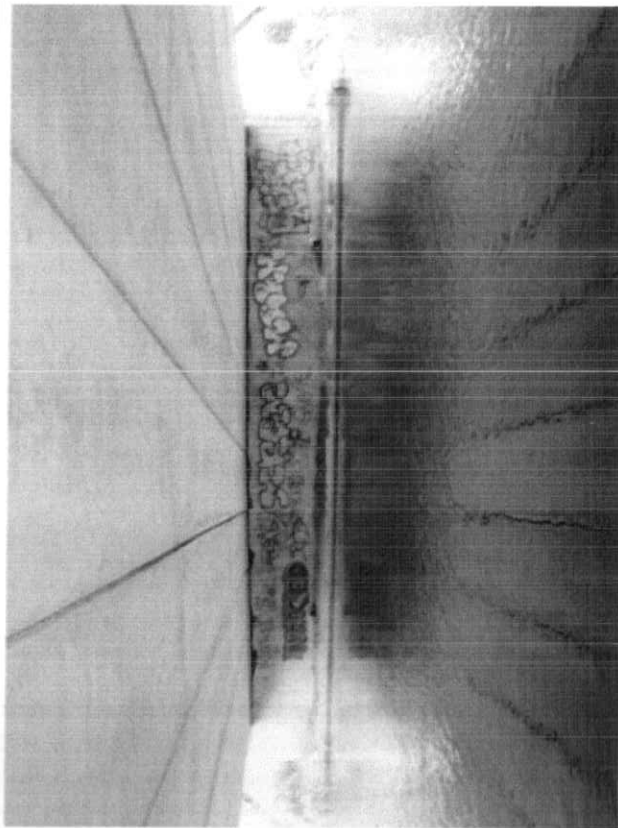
Bulging bearing material for bridges at the west abutment.
